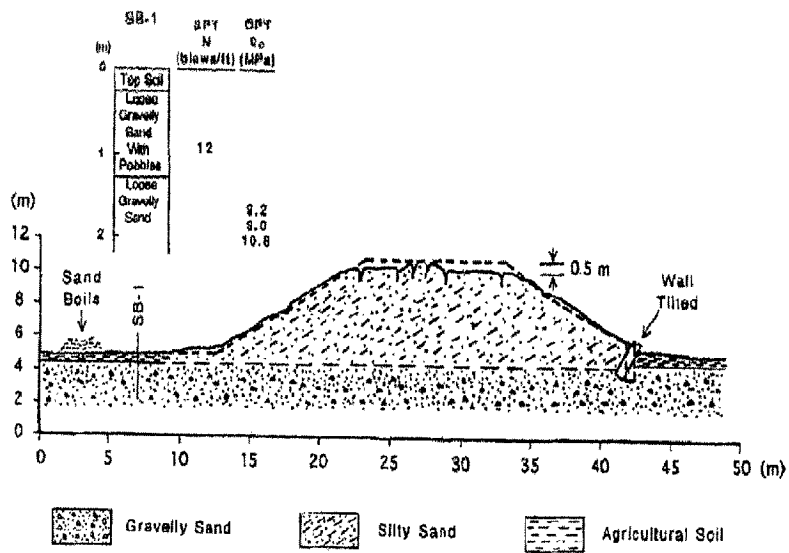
Spitak Highway Embankment Cross Section before and after Failure (Yegian et al. 1994)
